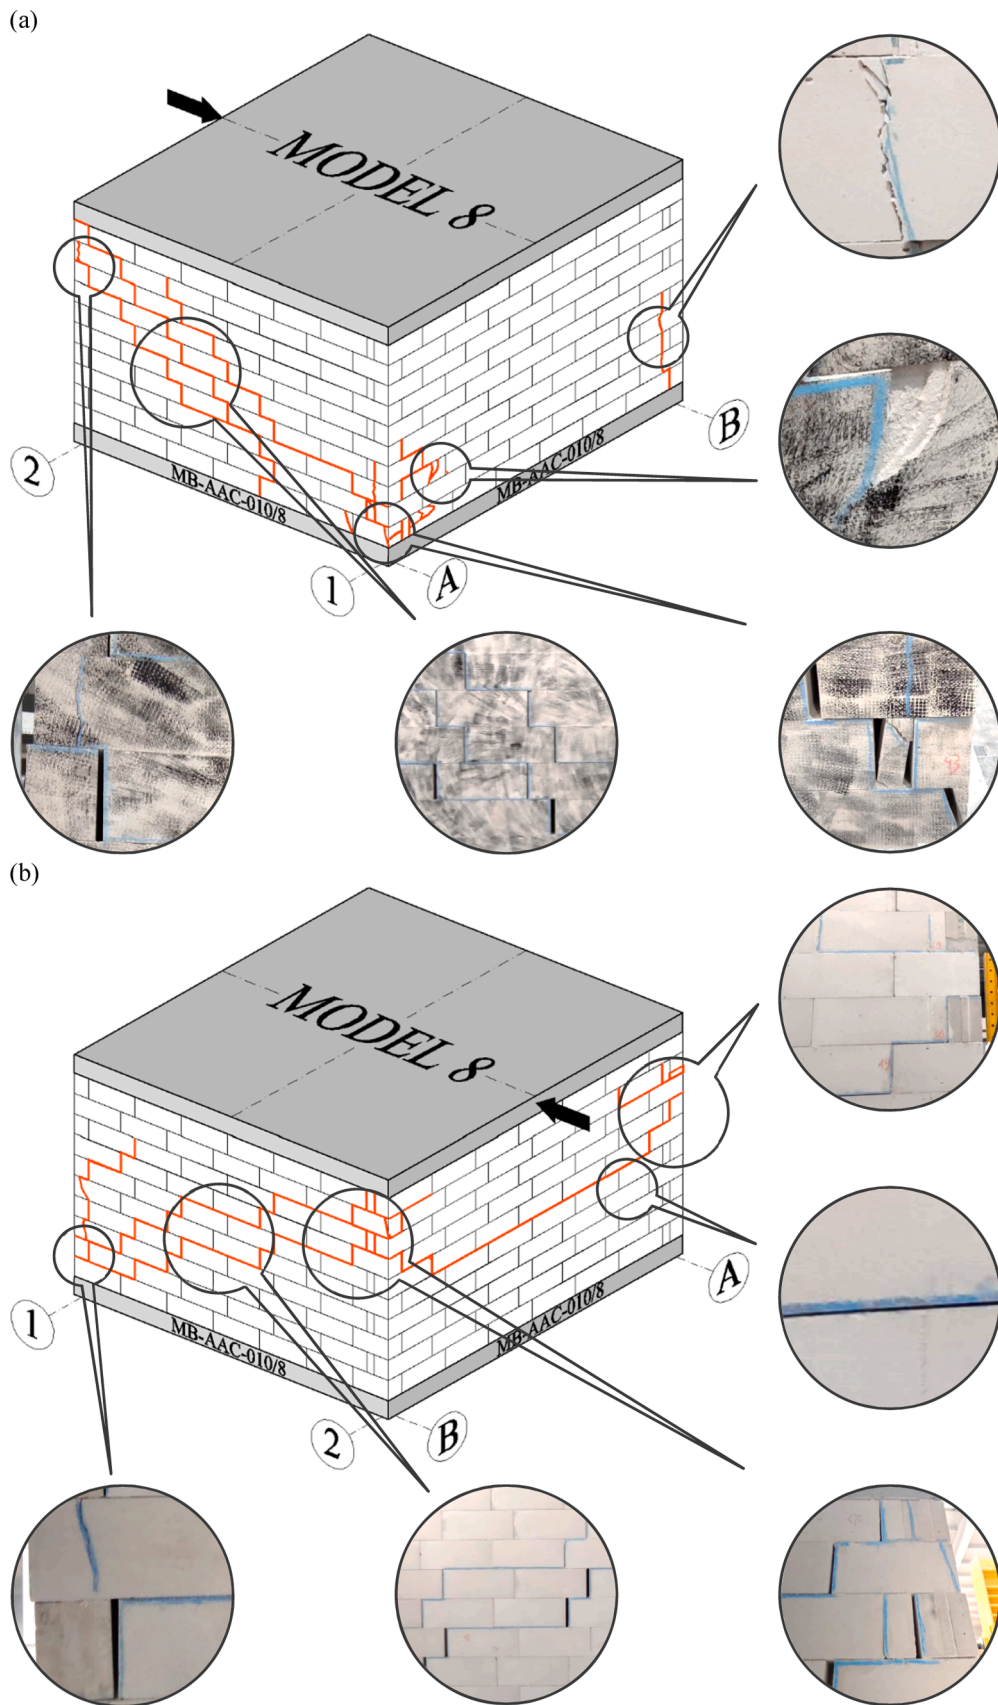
Damage pattern of building model 8: (a) solid stiffening wall A and solid wall 1, (b) solid stiffening wall B and solid wall 2.
